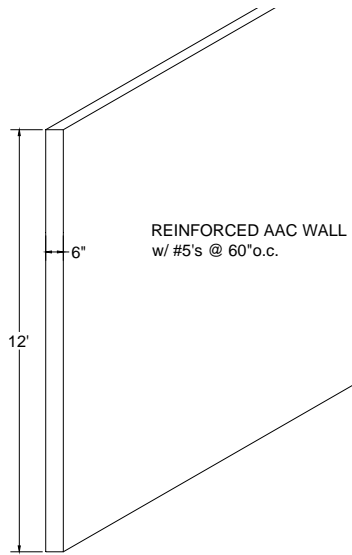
Example Problem Reinforced AAC Wall Axial Strength
